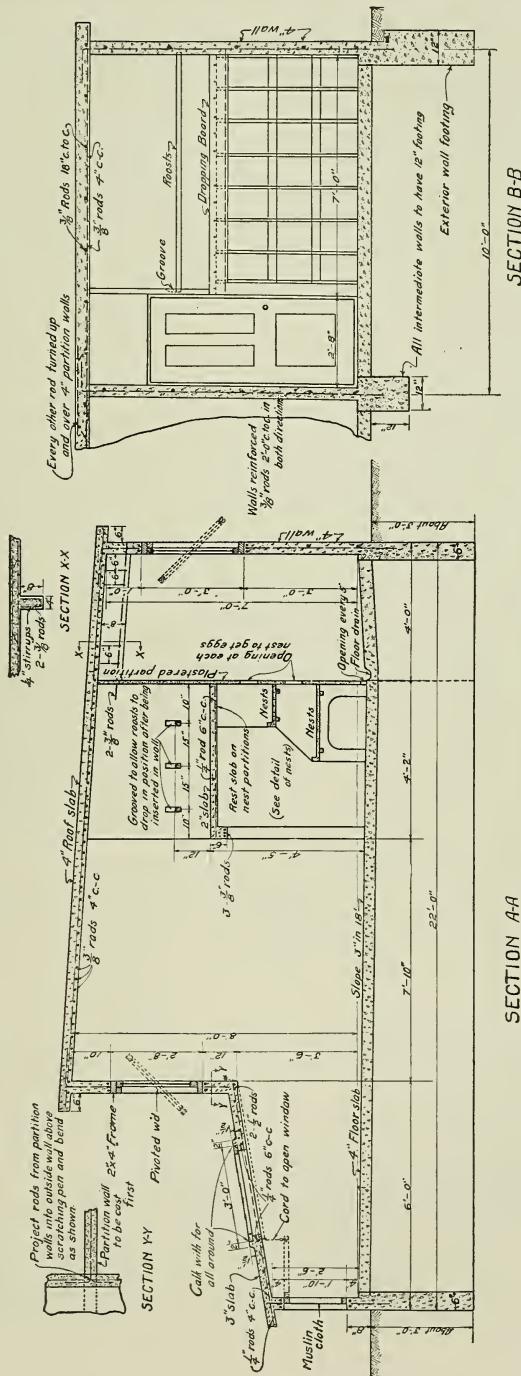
Sectional Views, Reinforced Concrete Poultry House.
